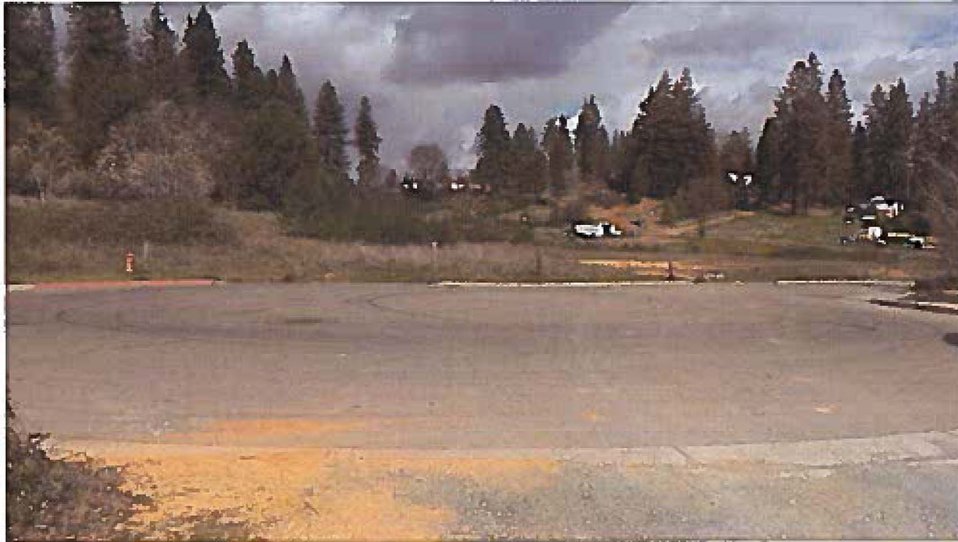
View of the Whitcomb Avenue cul-de-sac and the undeveloped material storage yard to the north of the project site access road (photo taken February 20, 2018).
